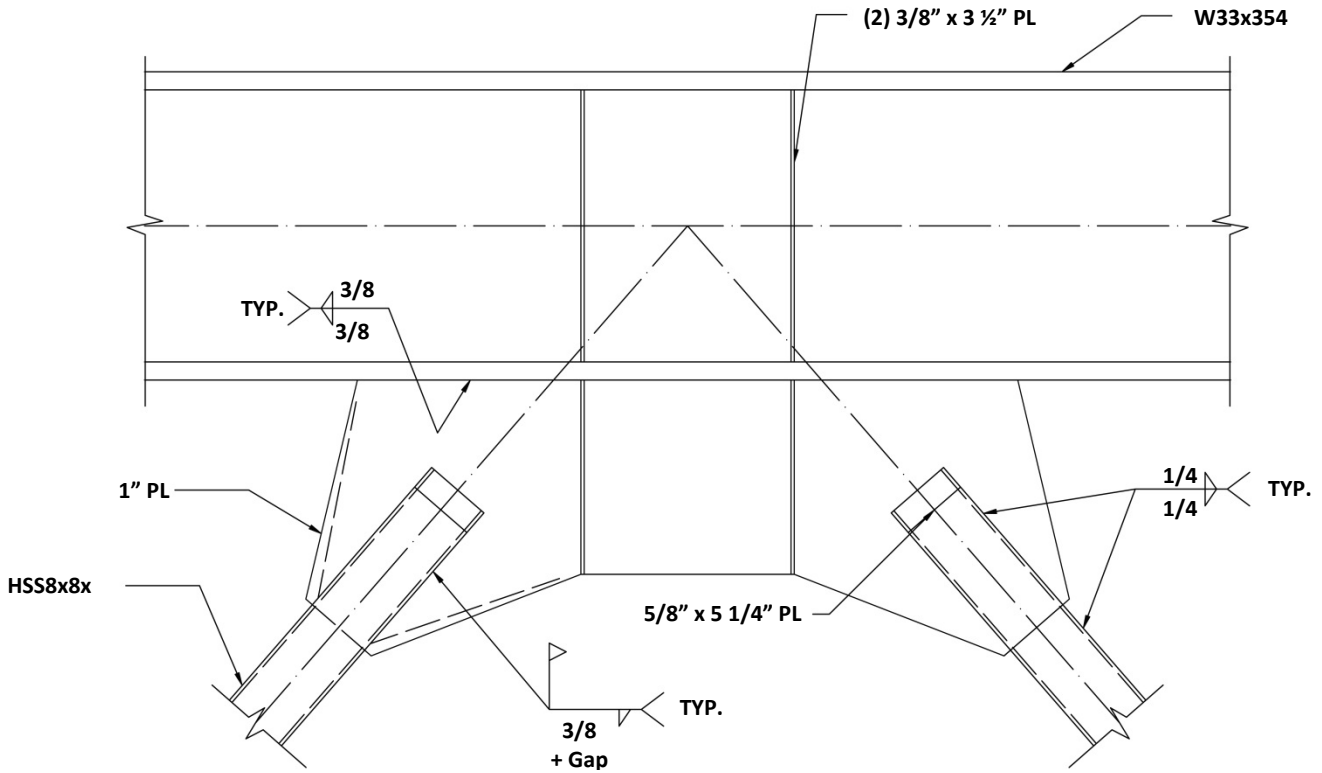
Designed Chevron SCBF Brace to Beam Connection
